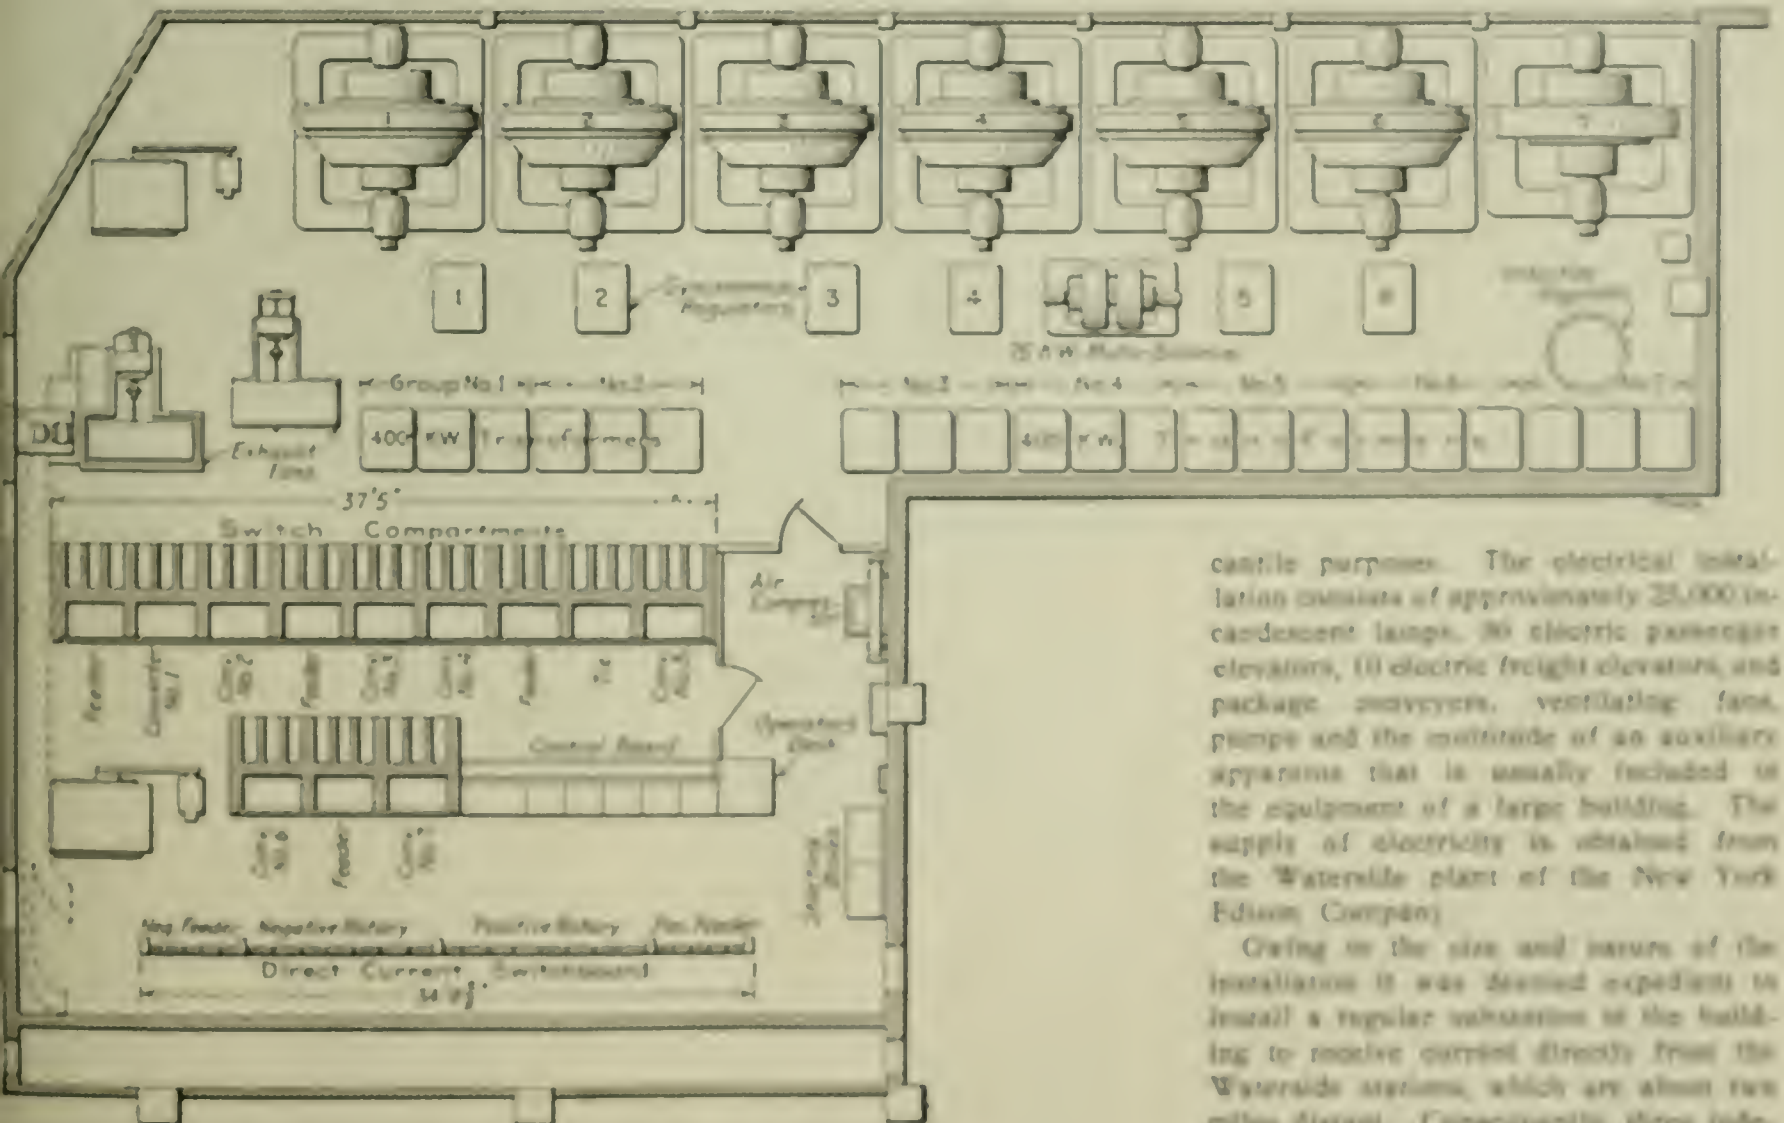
GENERAL ARRANGEMENT OF GIMBEL PLANT
